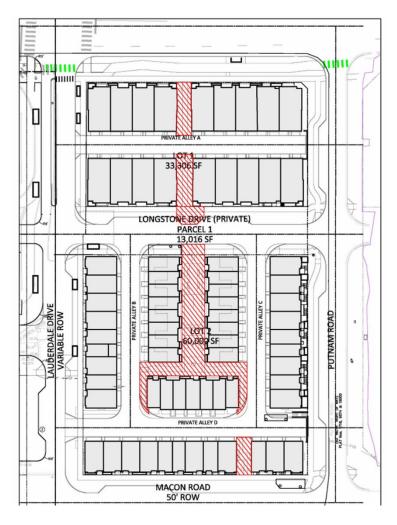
Proposed Common Open Space – Phase I Site Plan (shaded in red)
